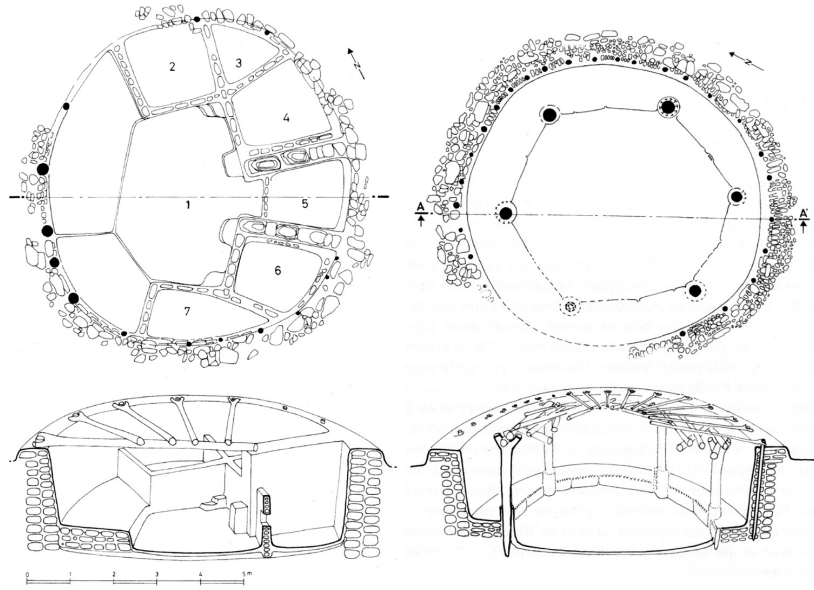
Jerf el Ahmar: special building EA 30 and EA 53, plan and reconstruction (after Stordeur et al. 2000.Figs. 5 and 9).
